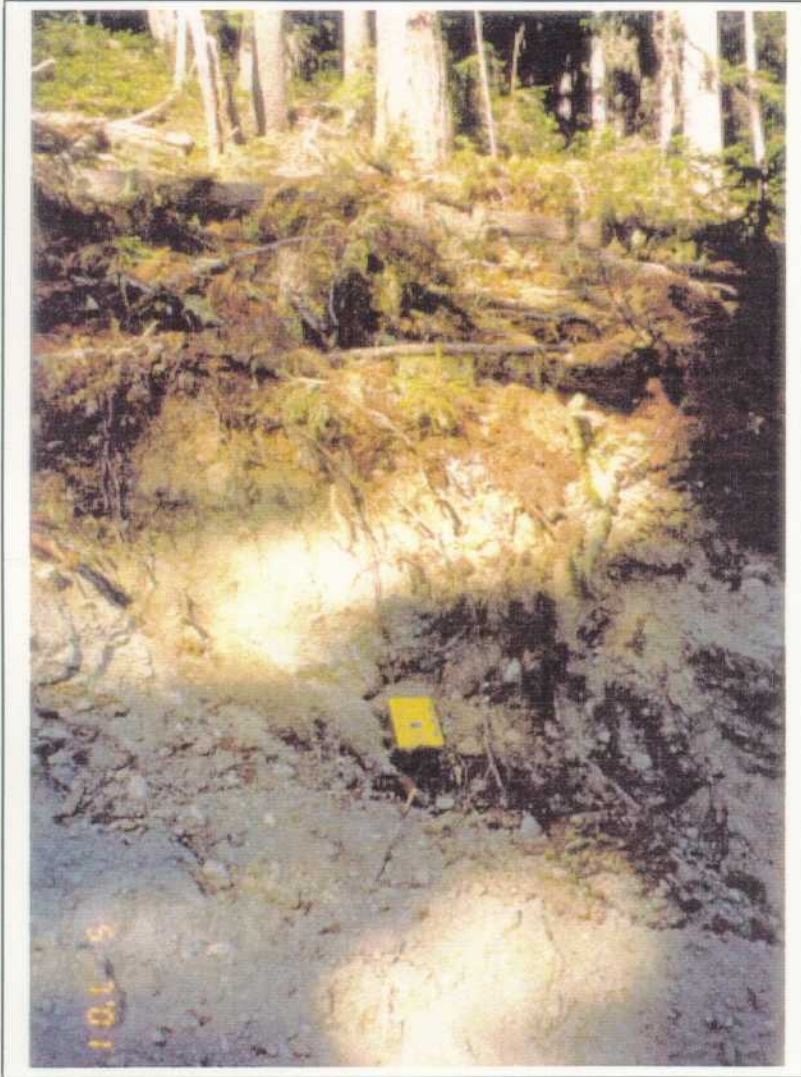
Non-compacted, silty, fine sand till in a recently constructed road cut located upslope of Stream Crossing #4.
